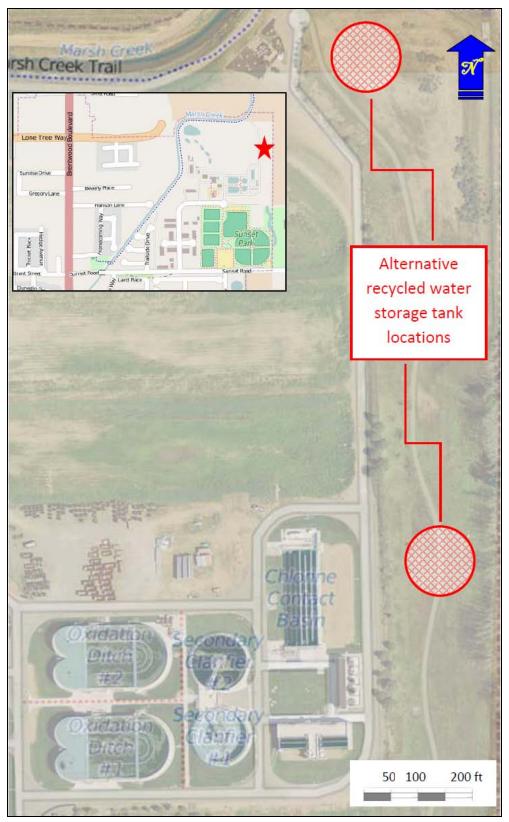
Site Plan for Recycled Water Storage Tank at the WWTP Location.
